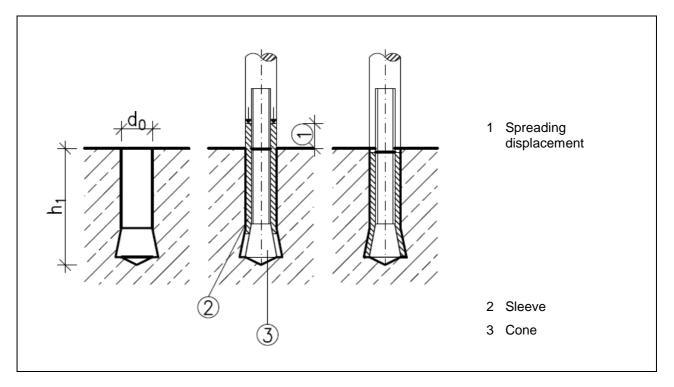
Fastener installation by hammering the fastener sleeve onto the cone
